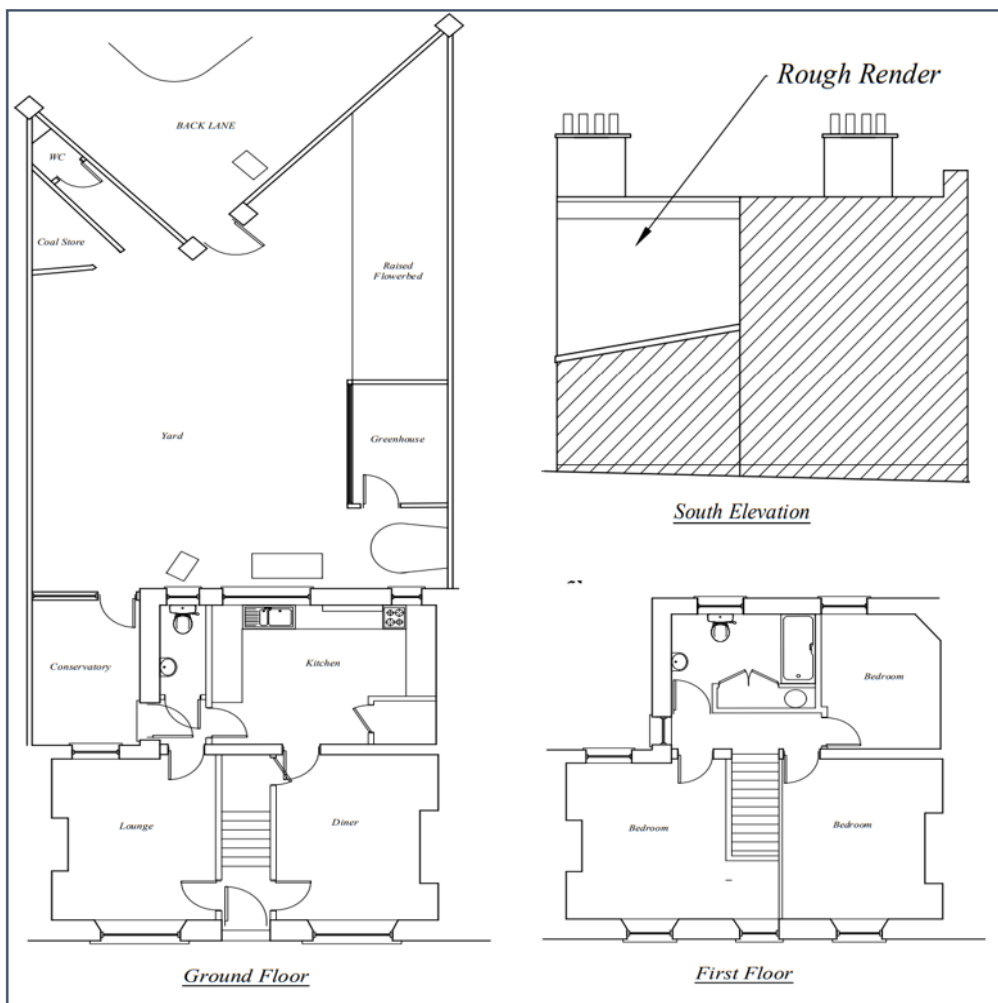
Existing ground and first-floor plans of St Eia, with south elevation (Paul Osborne).
